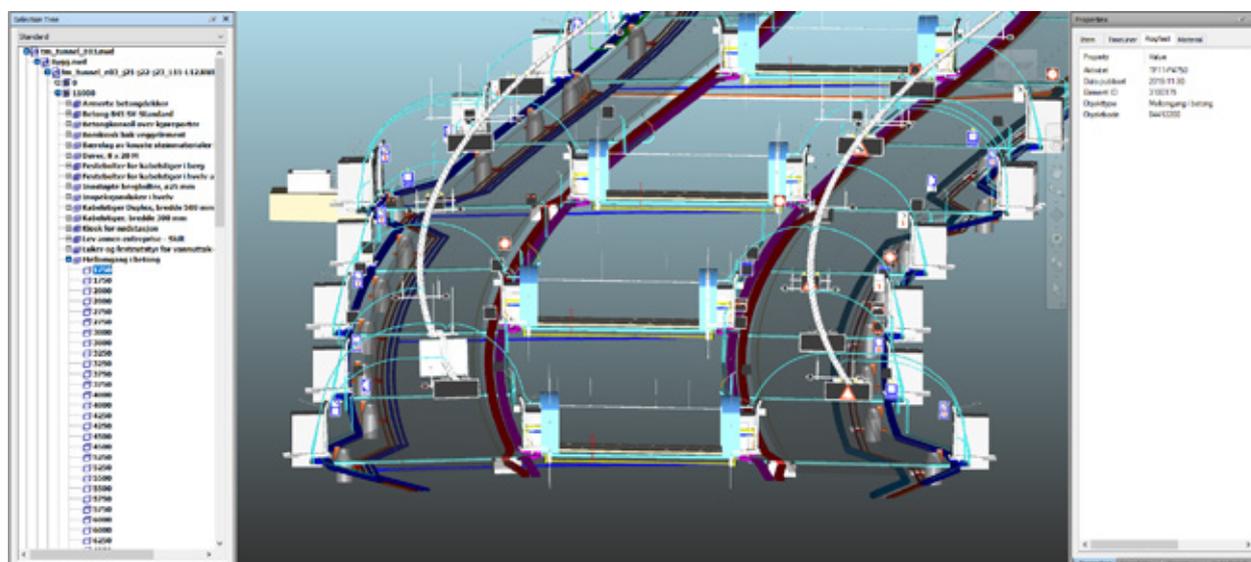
Example of tree structure and properties in a single technical installation at E39 Rogfast.
